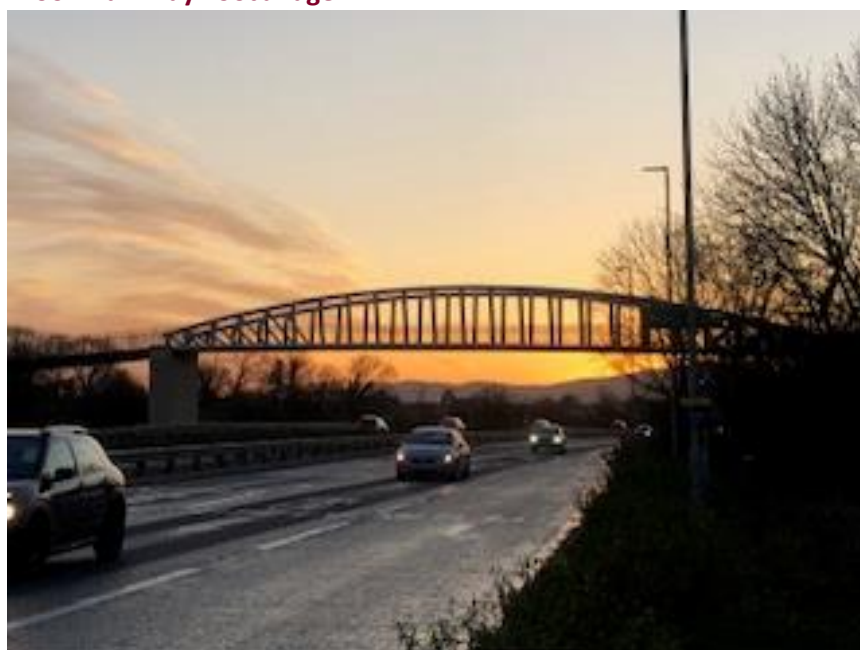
Broomhall Way Footbridge – spanning Worcester A4440 Southern Link Road Phase 3 (SLR3)
